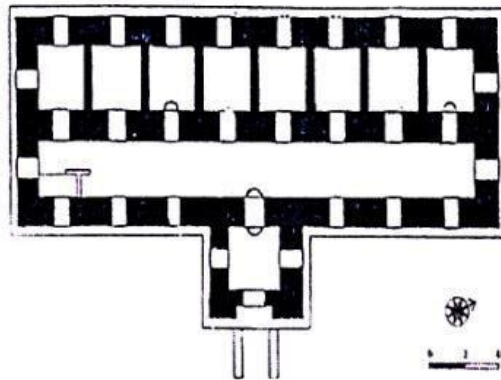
Floor Plan of the Excavated Site KKG-2 [1]
